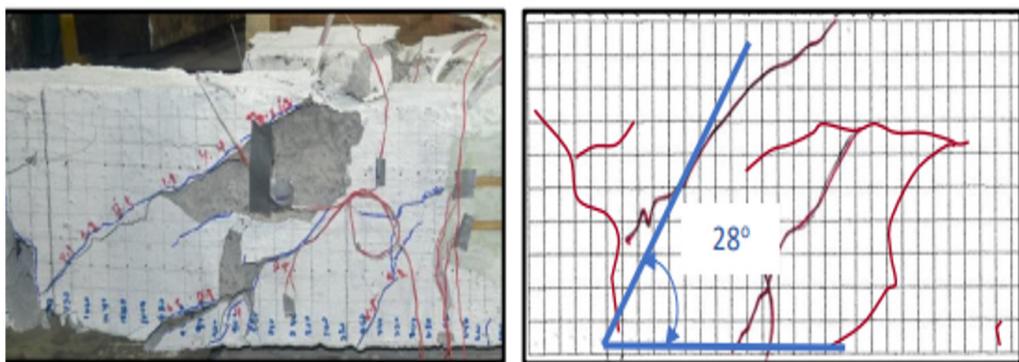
Critical crack width (CDC) of beam specimen (SCCBESP1.5)
